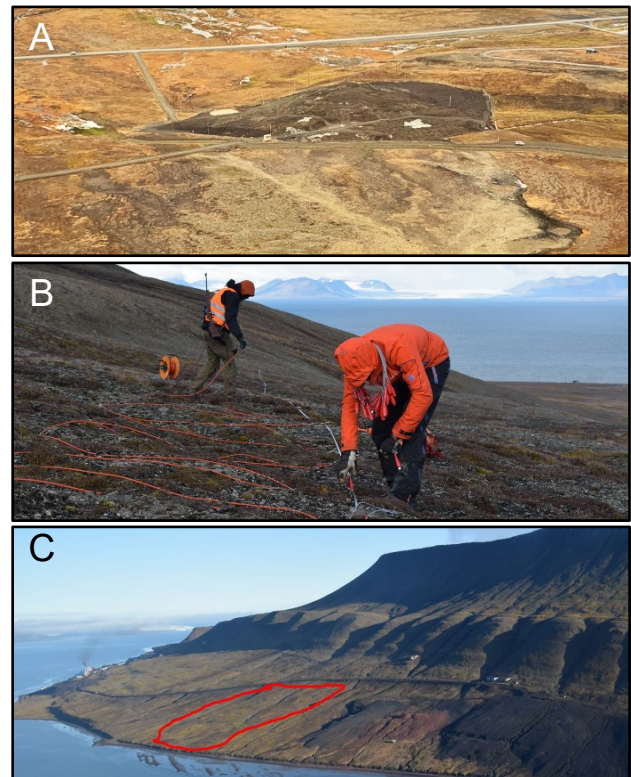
From top to bottom: Oblique image of former active landfill at site A; Outlay of ERT profile at prospective site B; Oblique image of potential site for new landfill (outlined in red) at site C.
